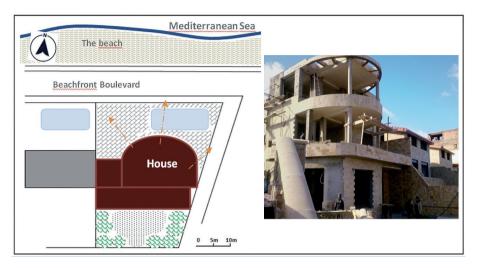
Ground plan of a contemporary seaside house (Source: author).
